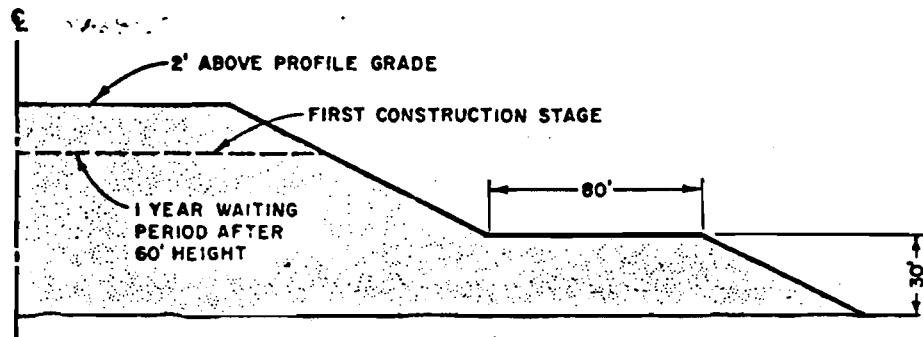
Typical half-section of stabilizing berm (from Ref 12).
